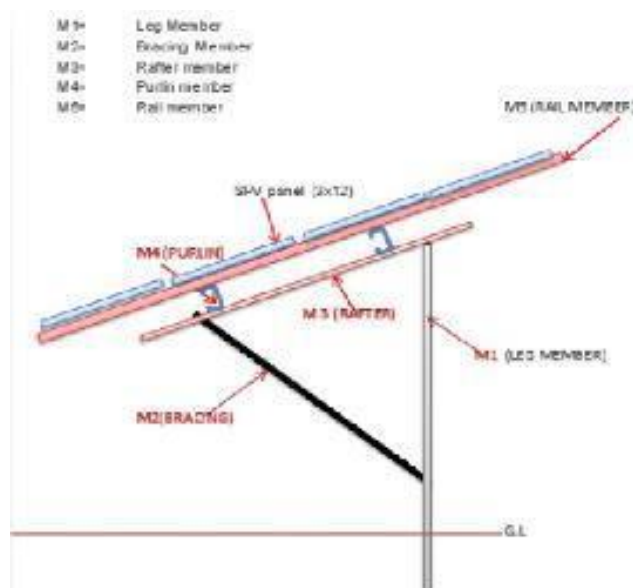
TYPICAL FIXED TILT MODULE MOUNTING STRUCTURE
